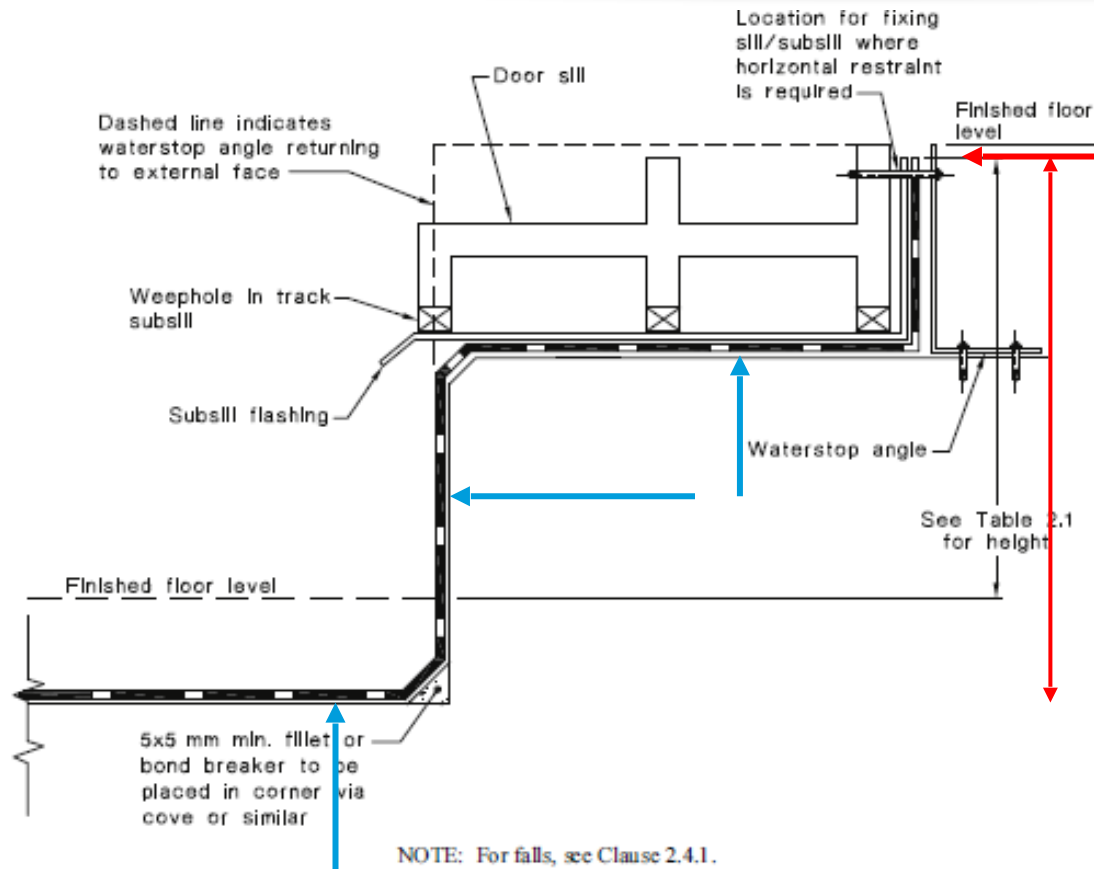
DETAIL OF MEMBRANE TERMINATION AT EXTERNAL OPENINGS DOORS
